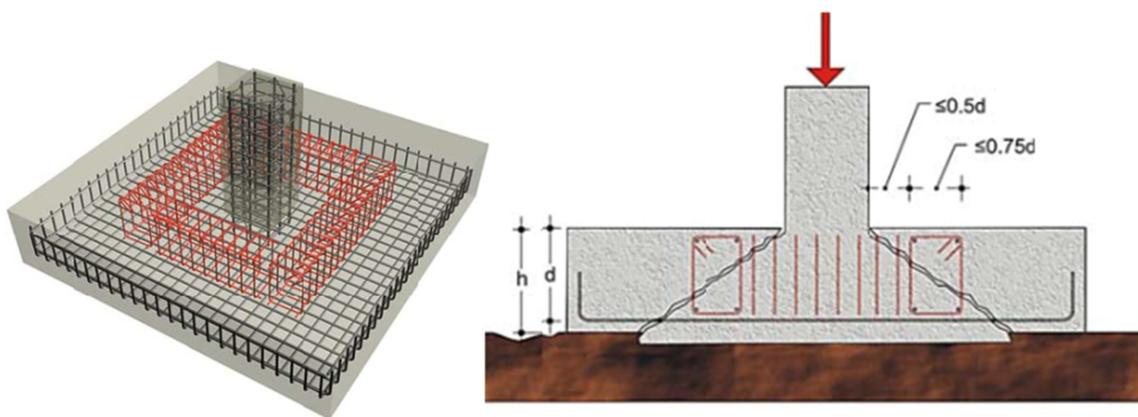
Links (stirrups) as punching shear reinforcement.
